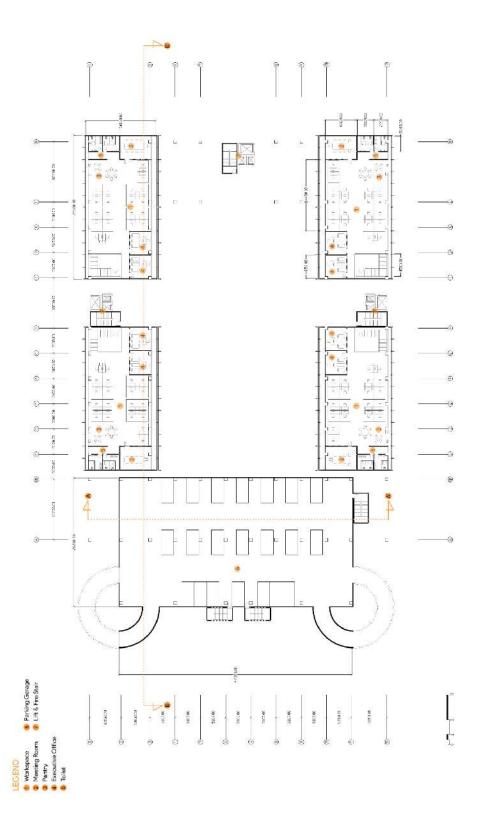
3rd Floor Plan (Source: Personal Illustration)
